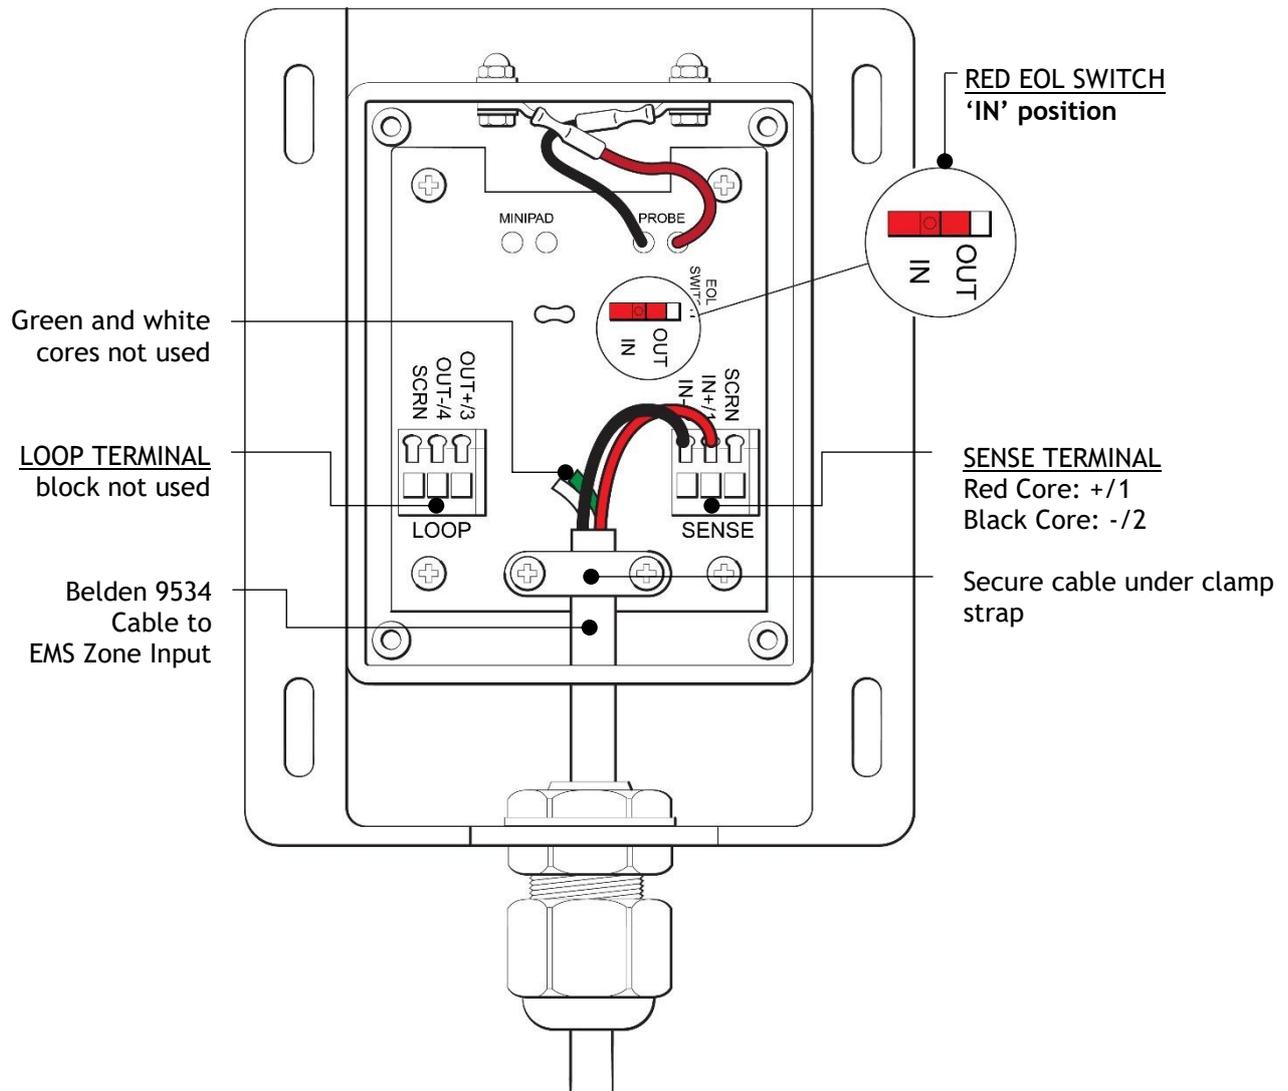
Sensor Cable Connection using Single ESD Sensor Probe
